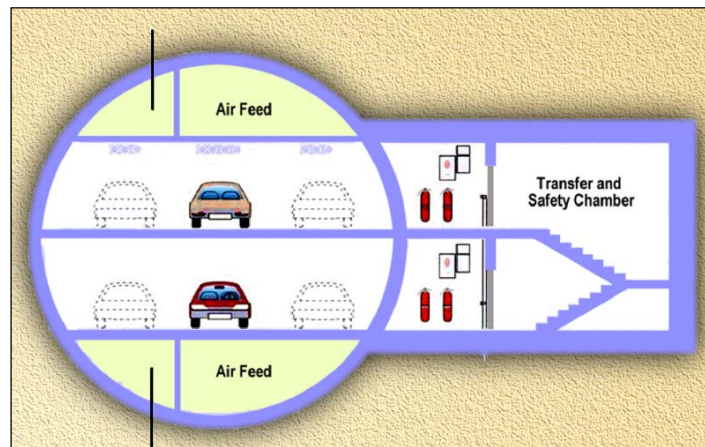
A86 Tunnel Schematic Tunnel Cross Section
